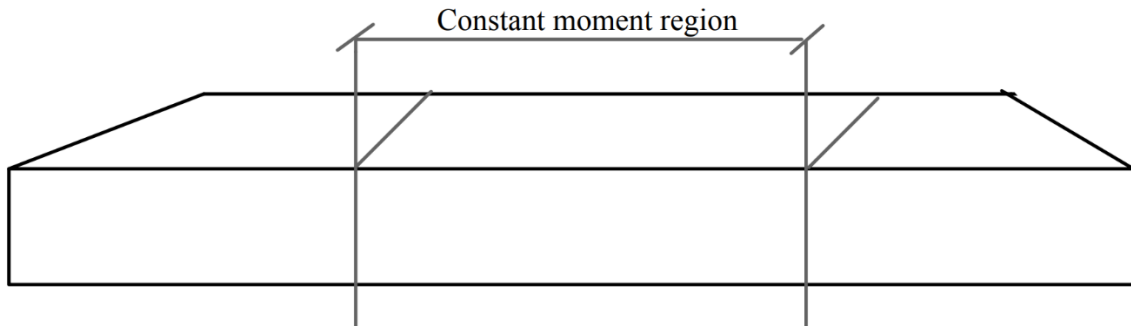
Crack Propagation for Monolithic Control Specimen at 0 % of Final Load
